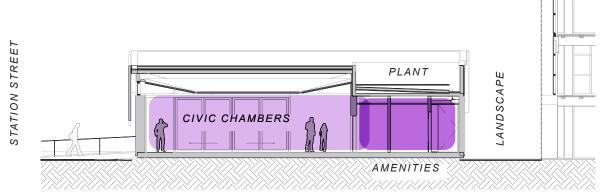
Cross section through the Chambers (looking east) with Station Street to the left and the Civic Administration Building to the right
